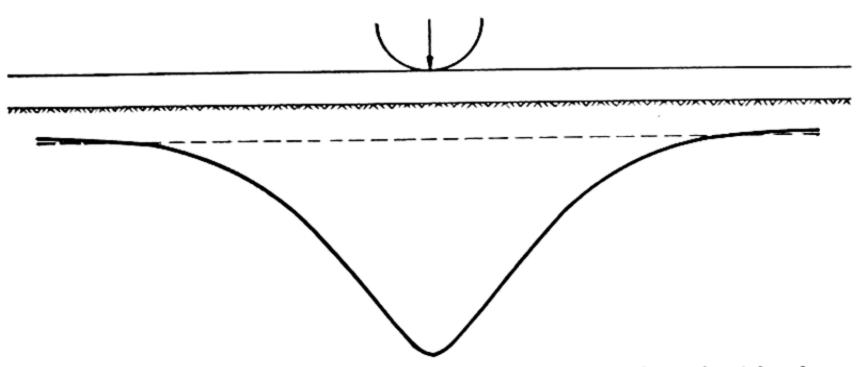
Illustrating curvature of road slabs under wheel loads.
